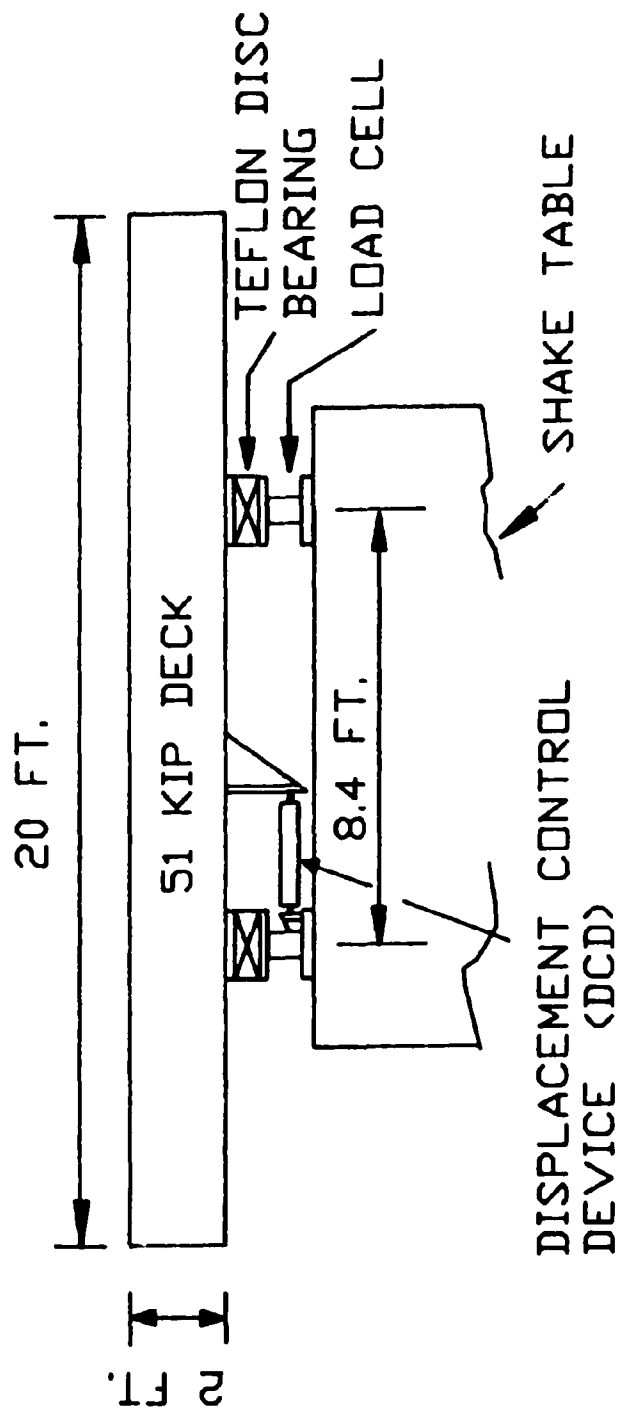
Elevation of Bridge Deck Model (1 Kip = 4.46 KN, 1 ft = 0.3 m).
